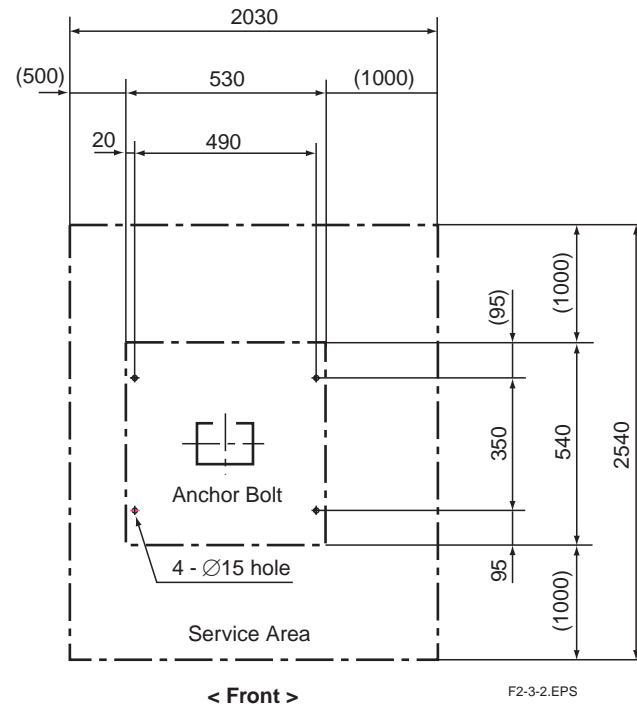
Anchor Bolt Positions and Maintenance Space Requirement (Standard Self-supporting Stanchion Type)
